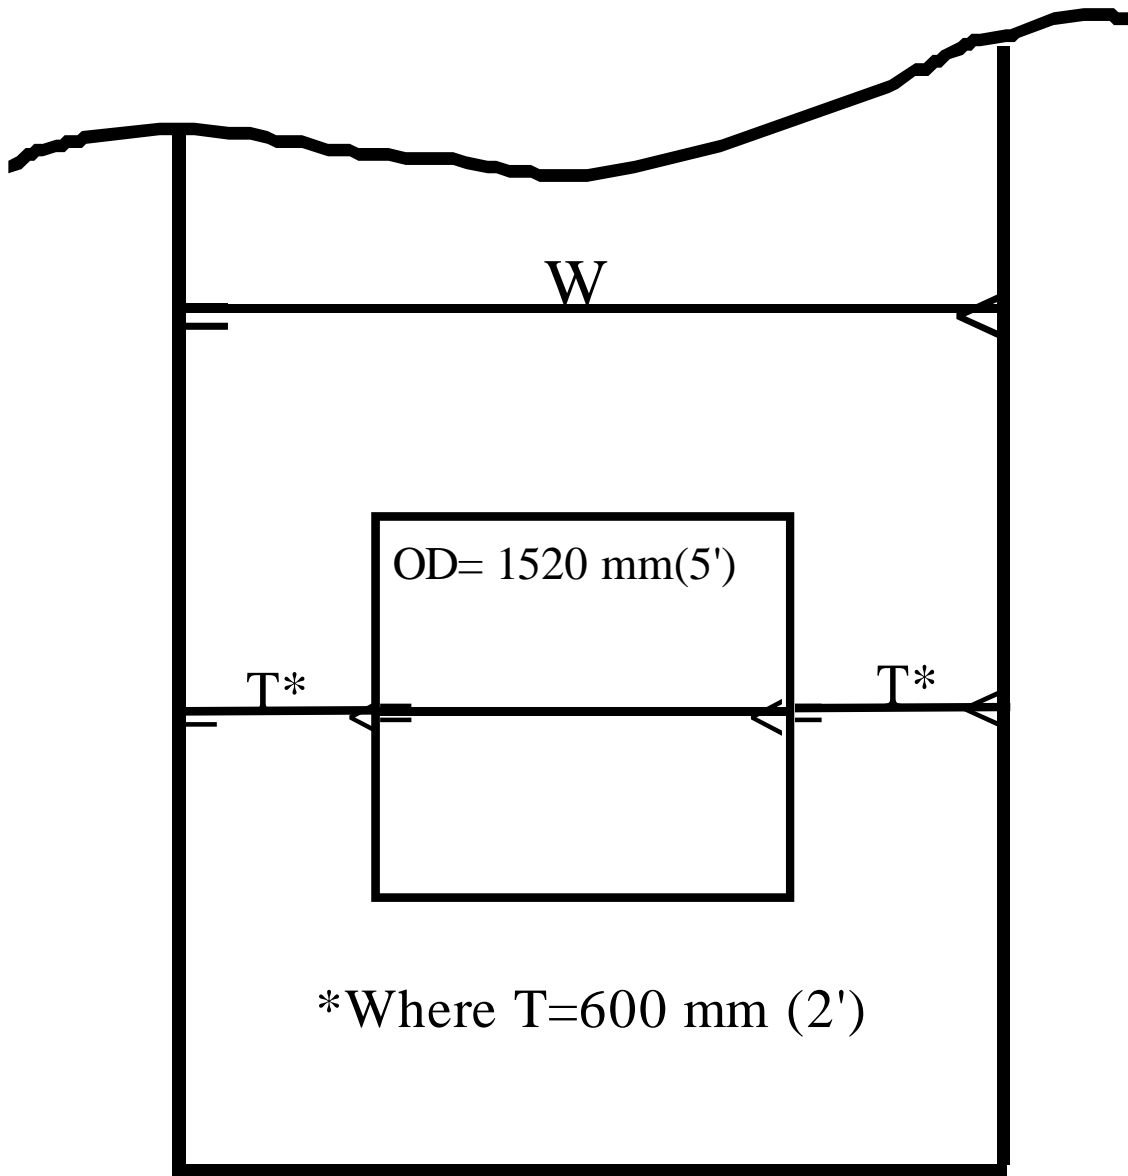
Minimum Trench Width for a Large Pipe Structure in a Cut
